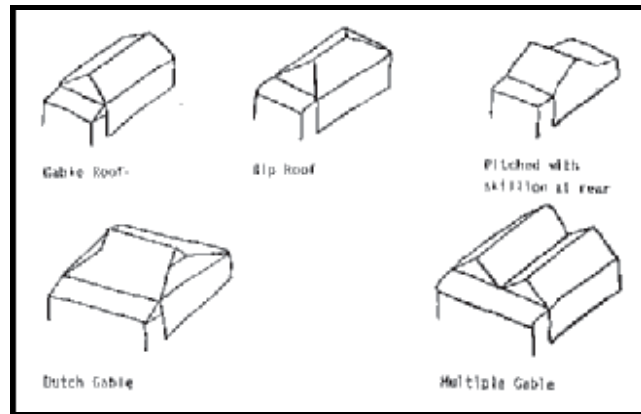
Example of Typical Queensland Vernacular Roof Designs (extracts from Design Guidelines for Rural Townships).
